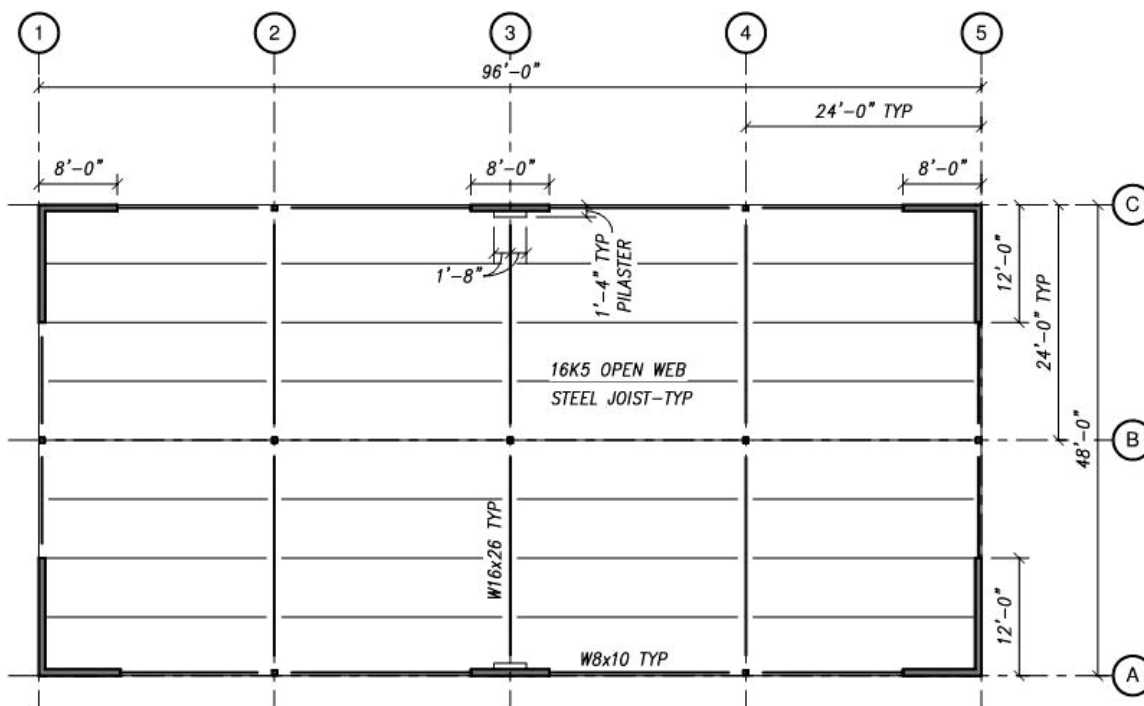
Two-story commercial building roof framing plan: COM2, COM5, COM8.
